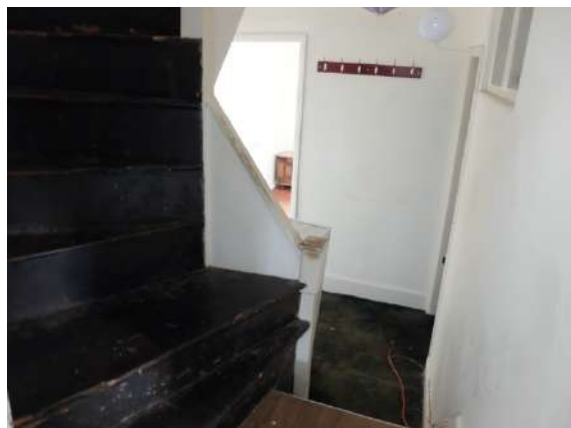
84 F4 C19 Stained timber treads to second floor - boxed-in C20 baluster and newel post
